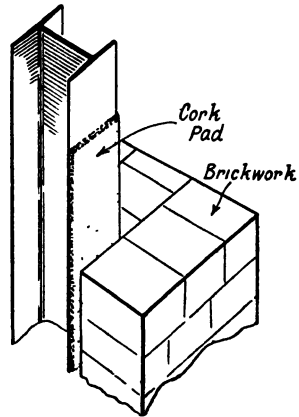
GIRDERS OF STEEL-FRAMED BUILDING WRAPPED WITH CORK TO PREVENT SOUND-TRANSMISSION BETWEEN GIRDERS AND BRICK PANELS
